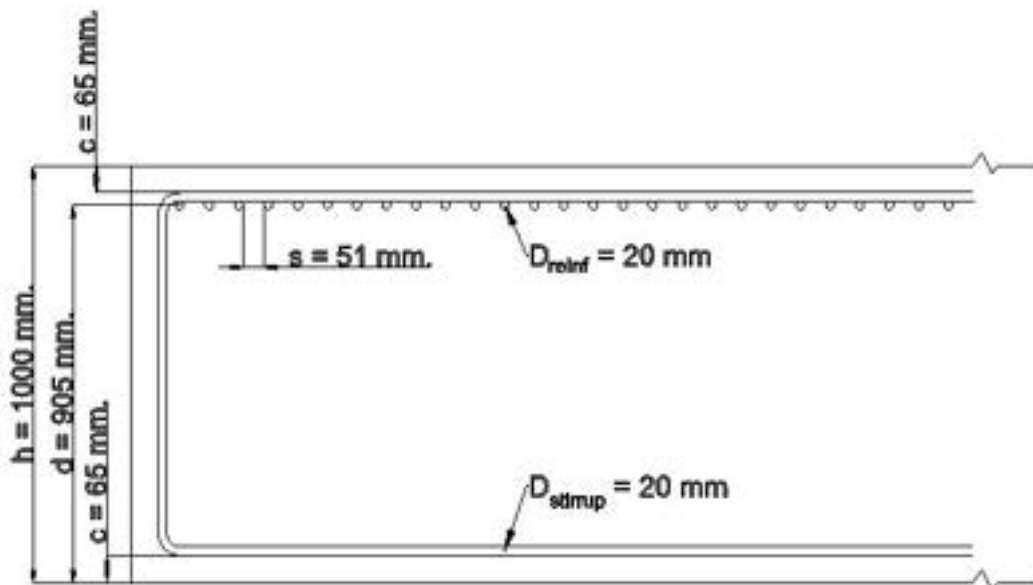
Reinforcement needed to resist the design bending moment. Vertical cut of the water-retaining wall.
